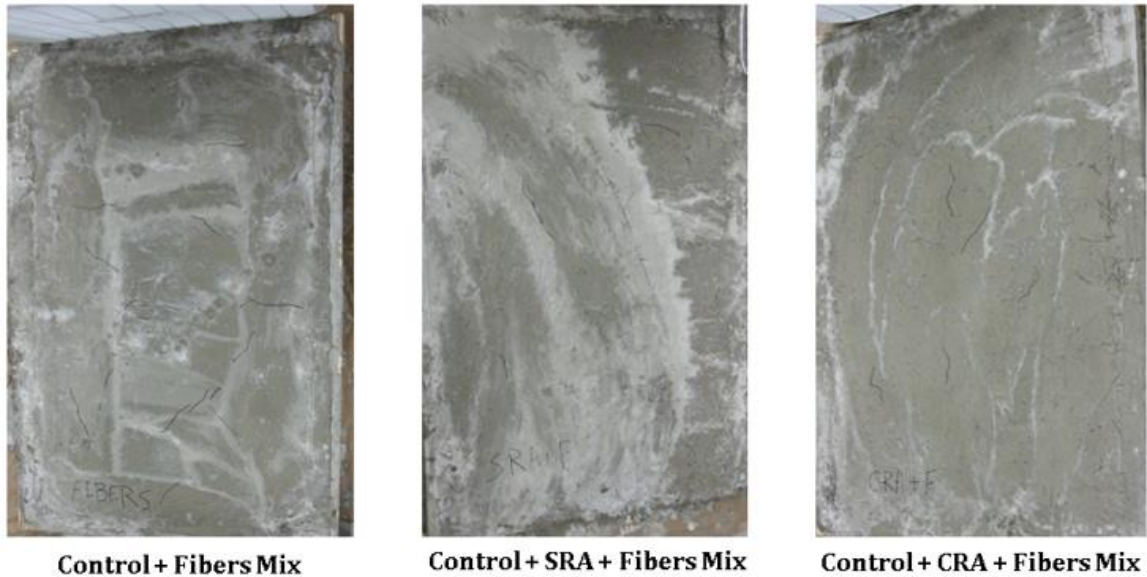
Typical Crack Patterns in Fiber-Reinforced Concrete Mixtures
